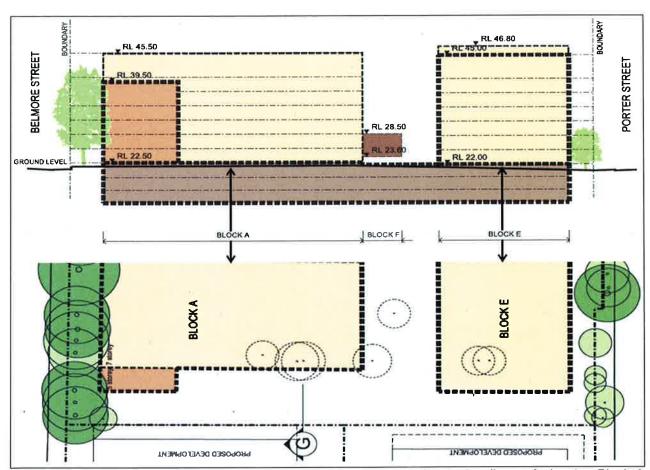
Southern elevation from the boundary (top) and sectional site plan (bottom) showing Block A (left), Block E (right) (Base source: PPR).
